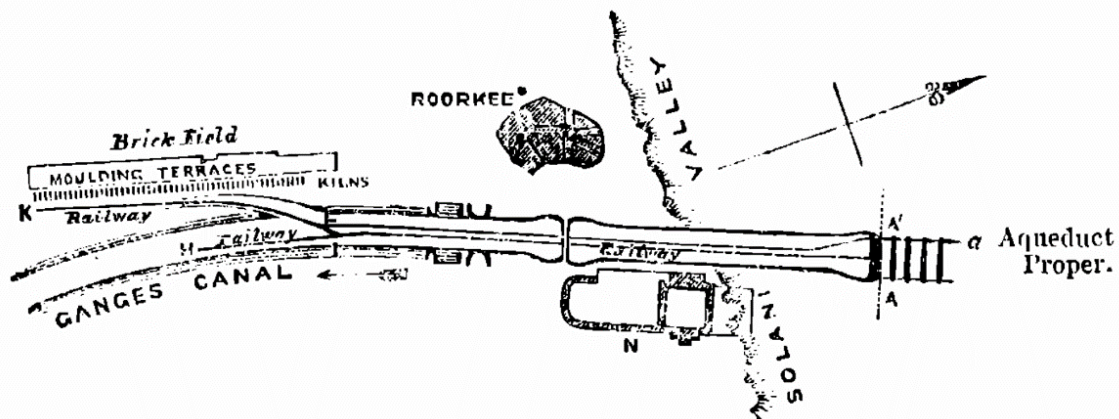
Plan showing the railway track, workshop, aqueduct and brick fields.
